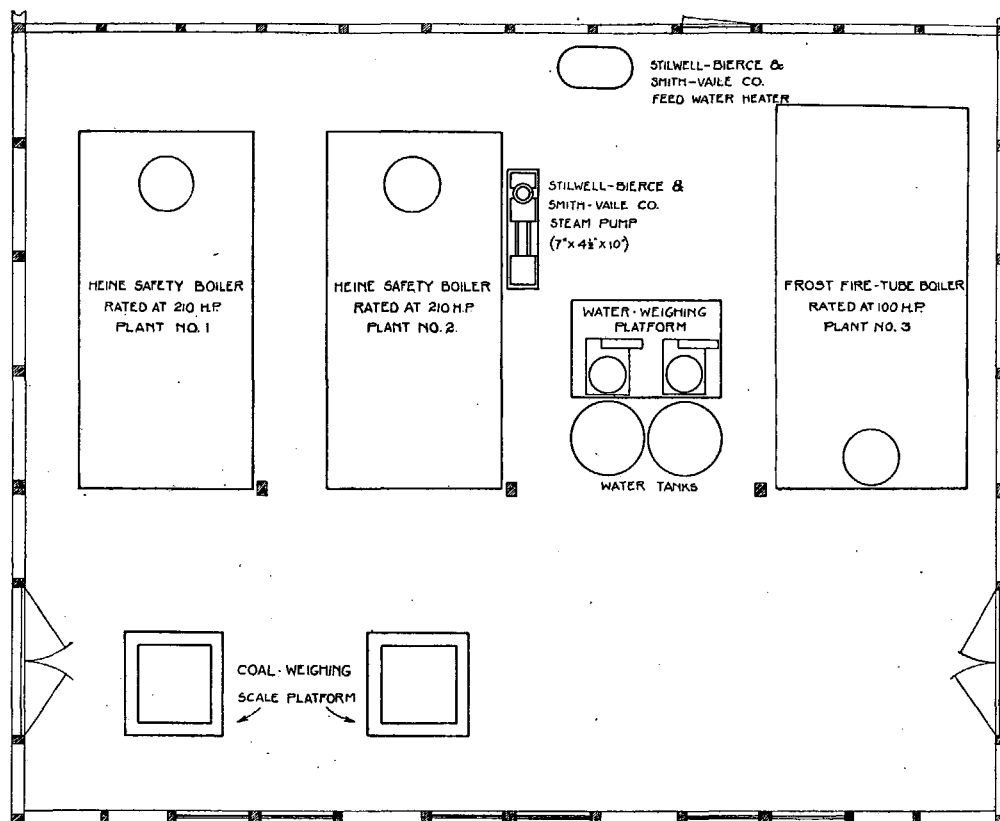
Plan of boiler room, showing location of boilers and equipment.
